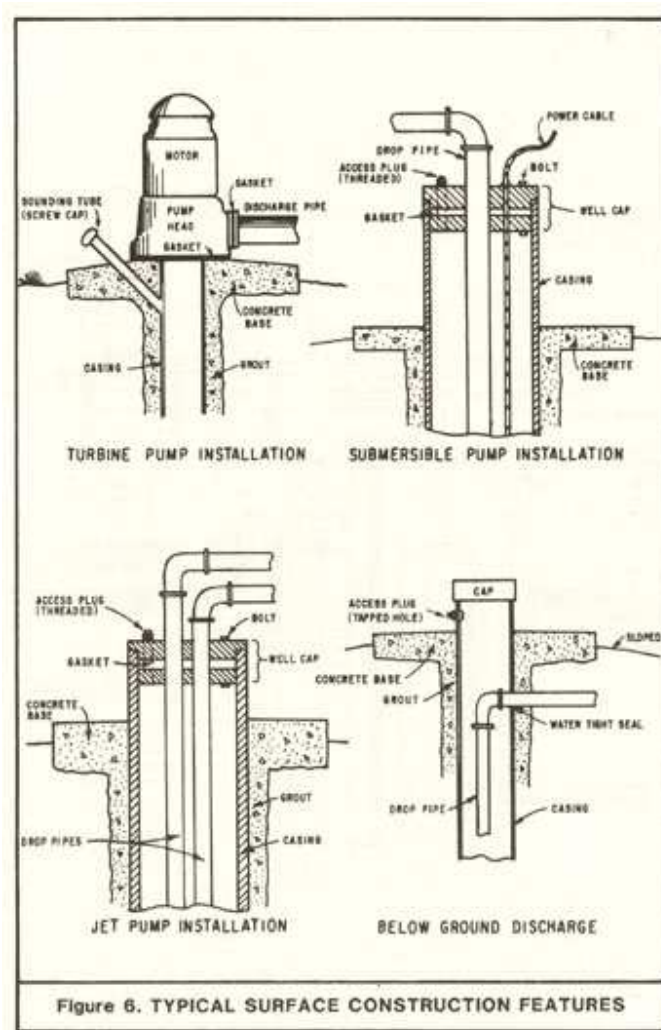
TYPICAL SURFACE CONSTRUCTION FEATURES
